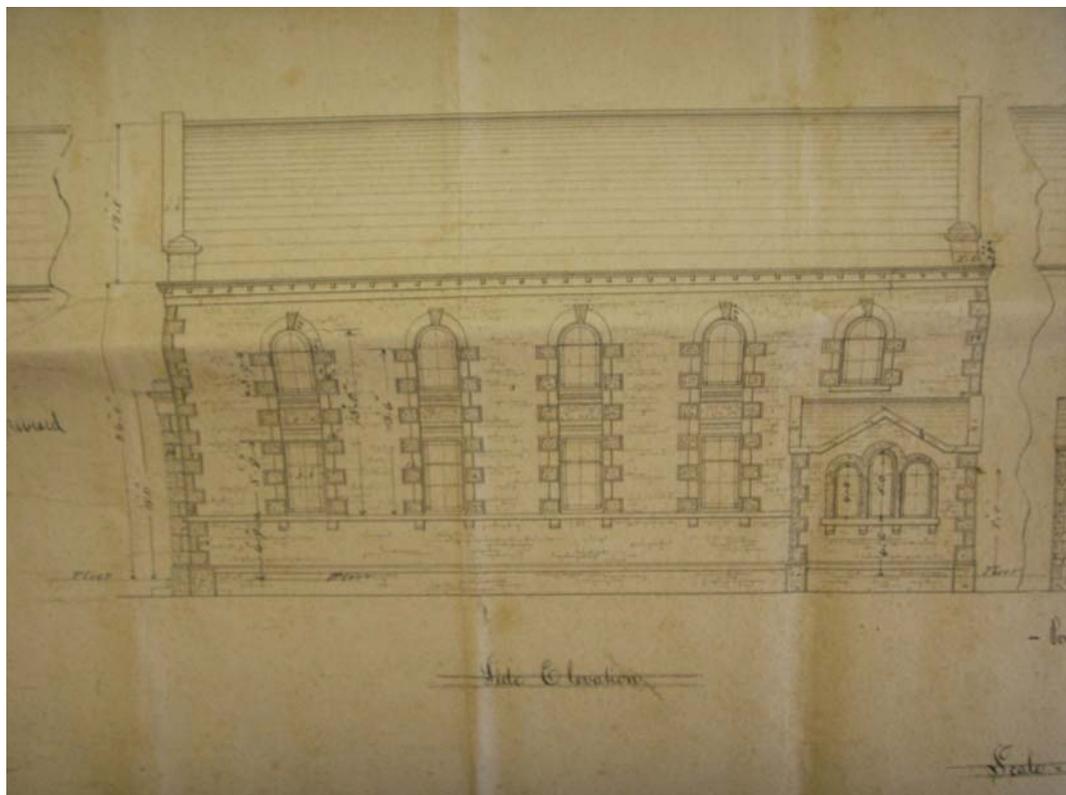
North external elevation as proposed in original drawings of 1872 (CRO(B) Z1099 1872)
